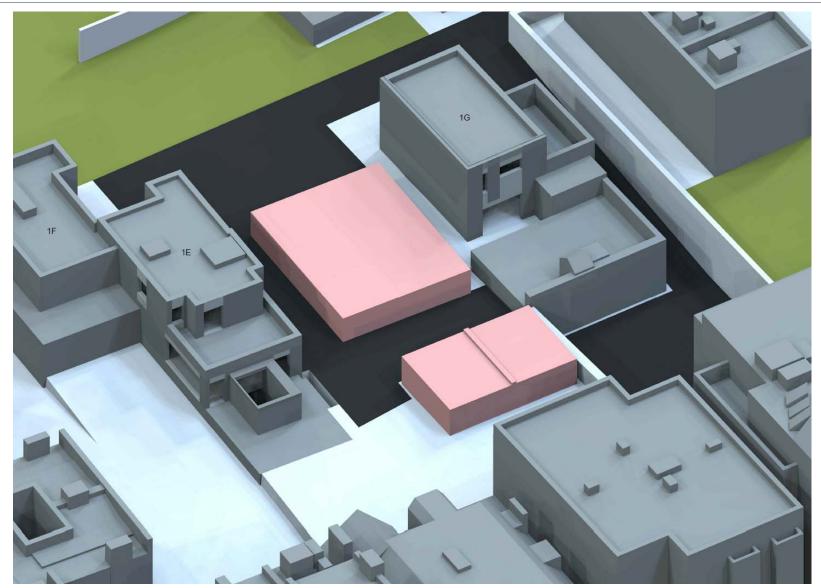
Our 3D model showing the Site and existing buildings in red (drawing ref BRE/02)
